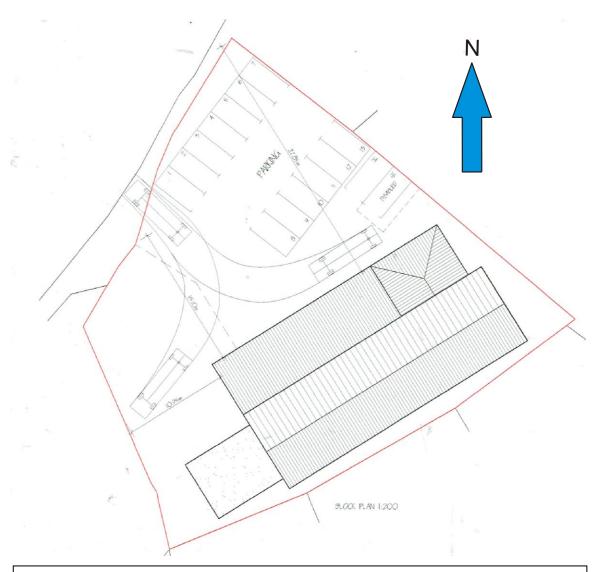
Block plan showing the proposed layout of the development site at an original scale of 1:200 at A1, (not to scale), (extract from Architects plan)
